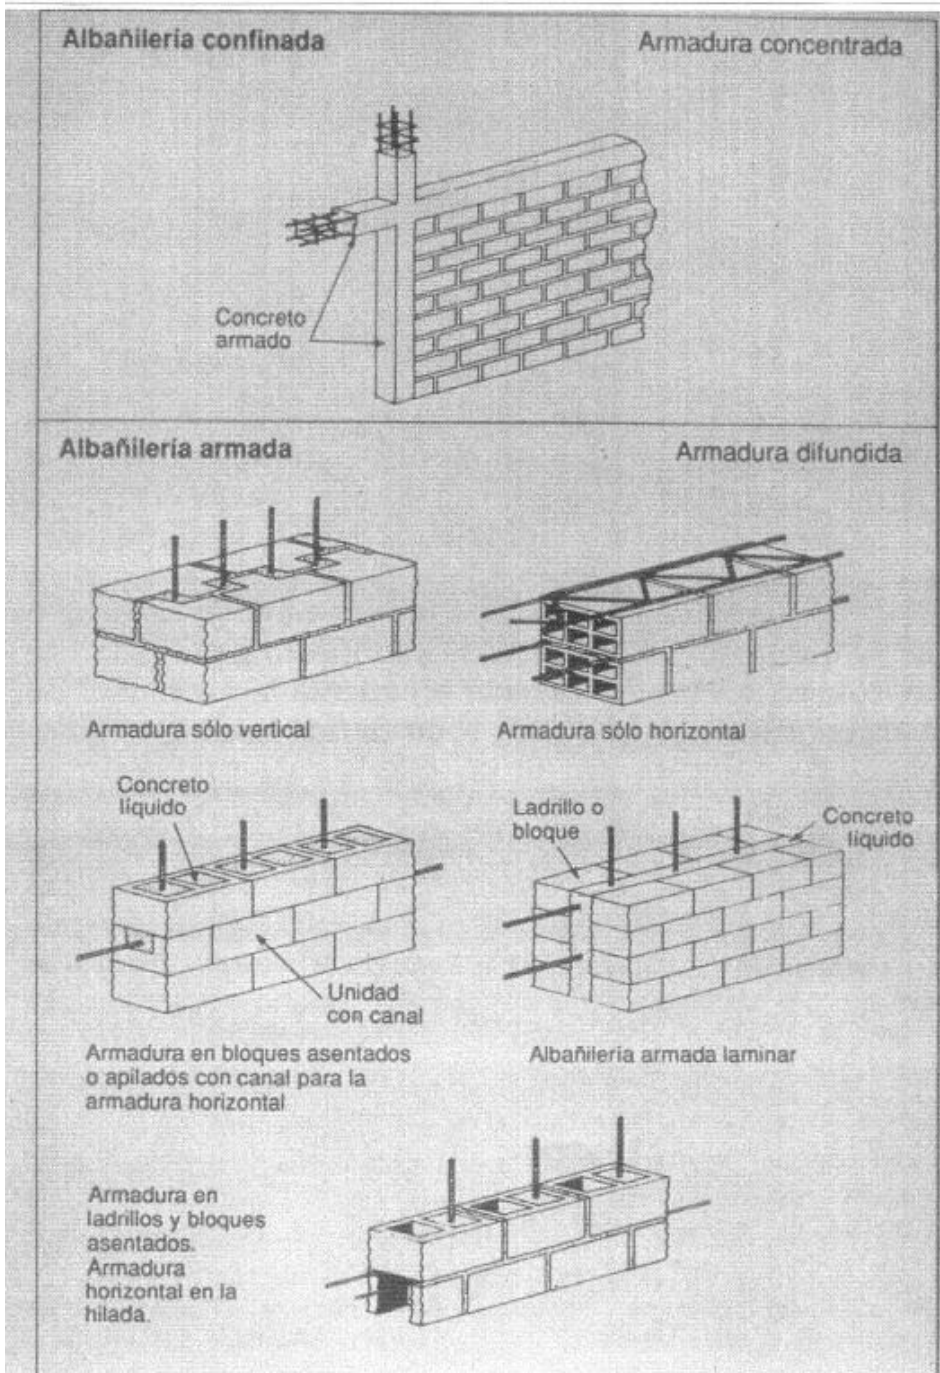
Construction approaches to reinforced engineered masonry construction.
